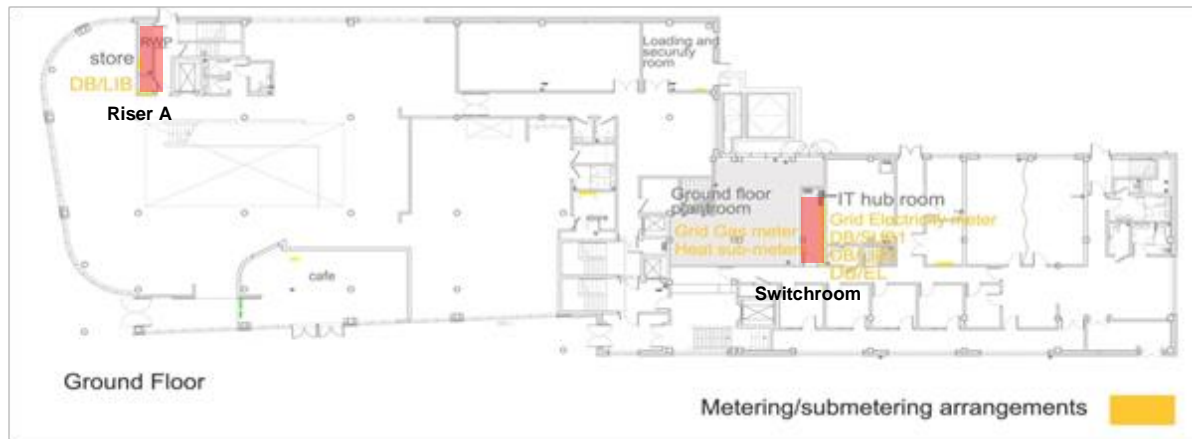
Metering and sub-metering arrangements in the ground floor plan.
